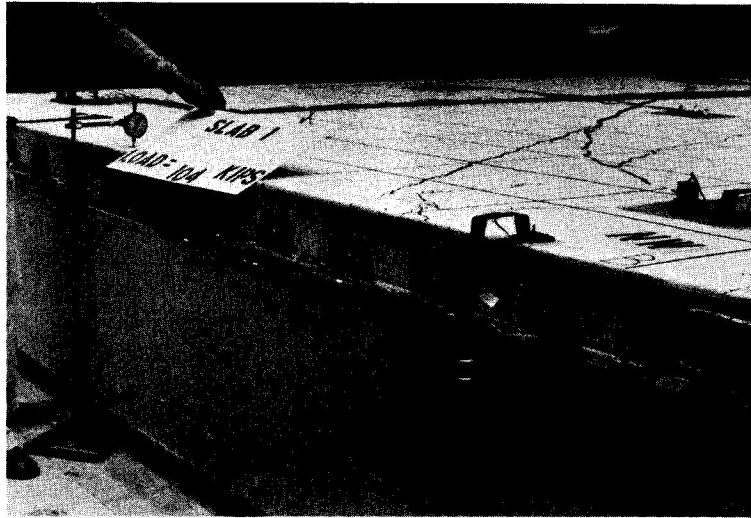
Local deformation of the steel deck corrugations (LP 38) (view of north edge).
